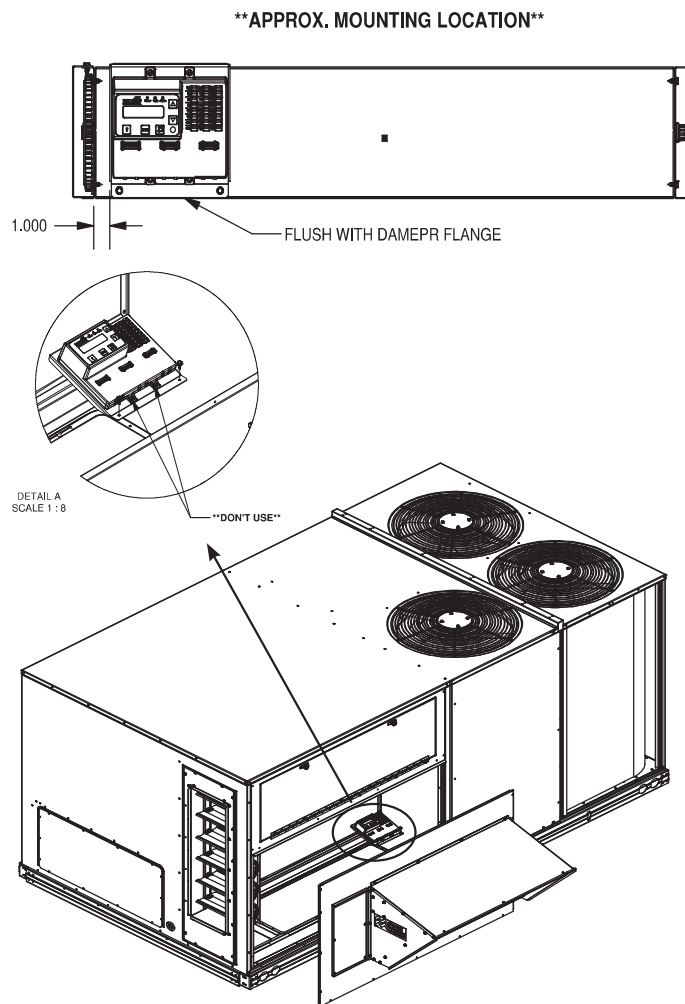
RA Approx. Mounting Location of Belimo ZIP Control
